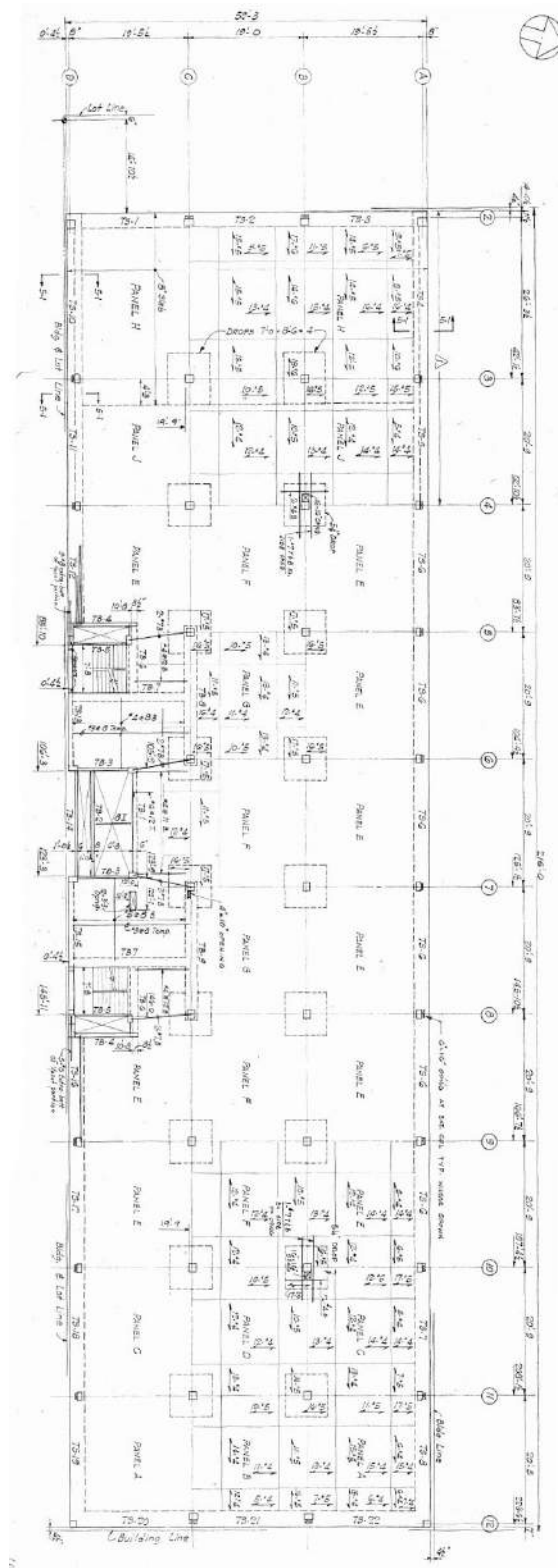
Typical Original Concrete Structure Floor Plan, From Existing Structural Drawings
